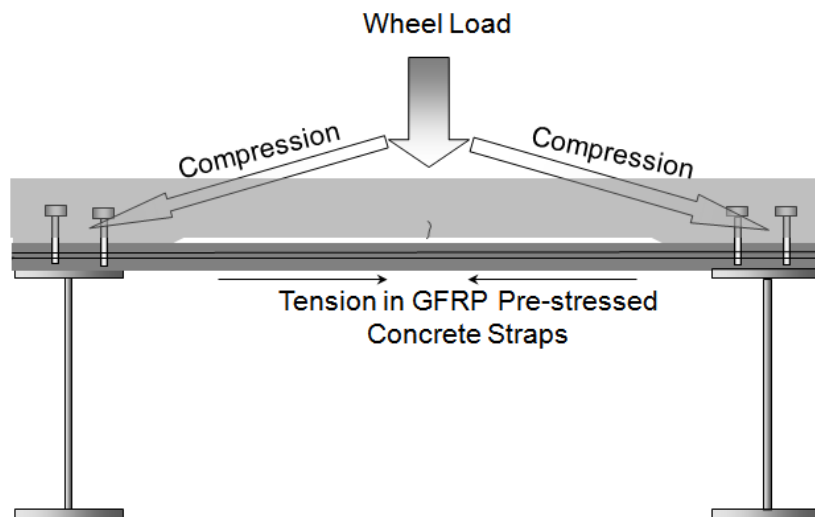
Steel-free bridge deck slab confined using GFRP prestressed concrete straps
